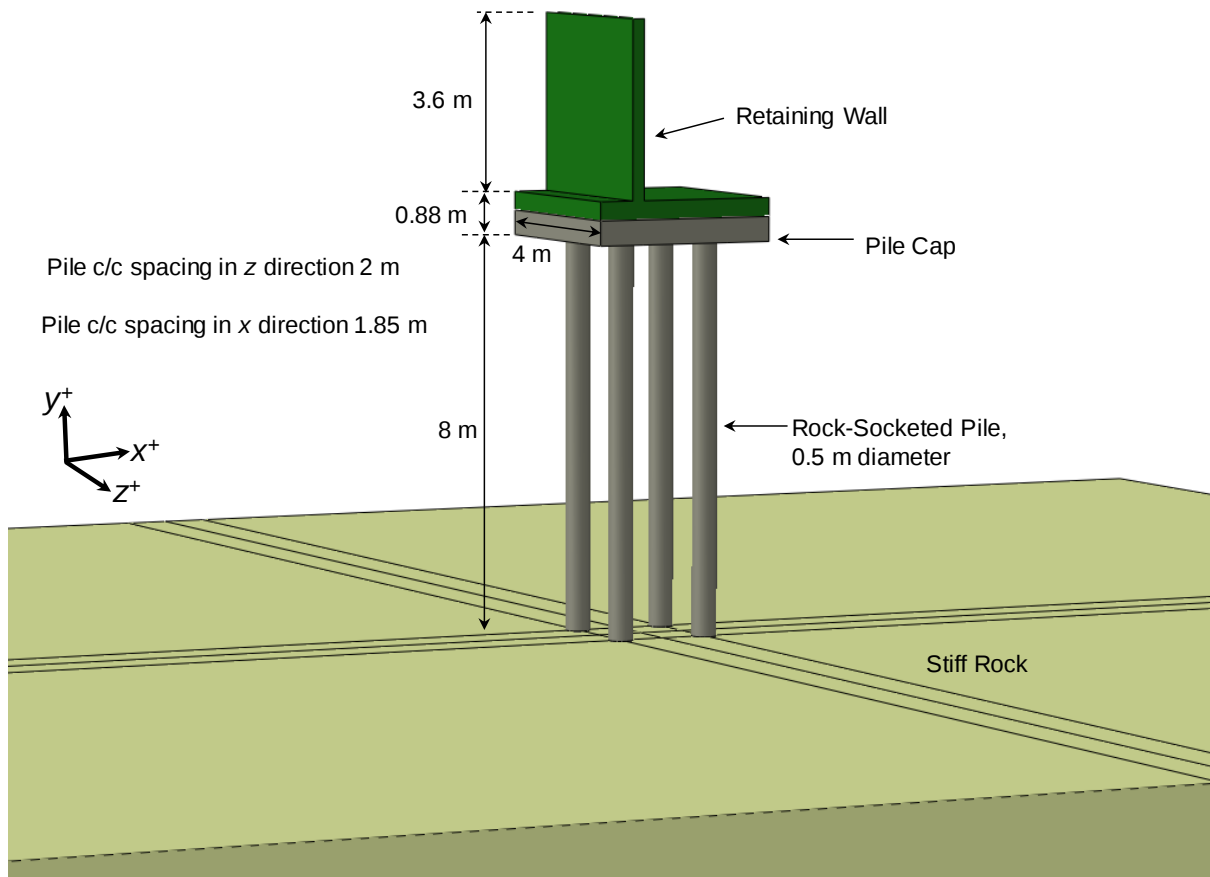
Geometrical details of 3D FE model of RW, supported with rock-socketed pile foundation.
